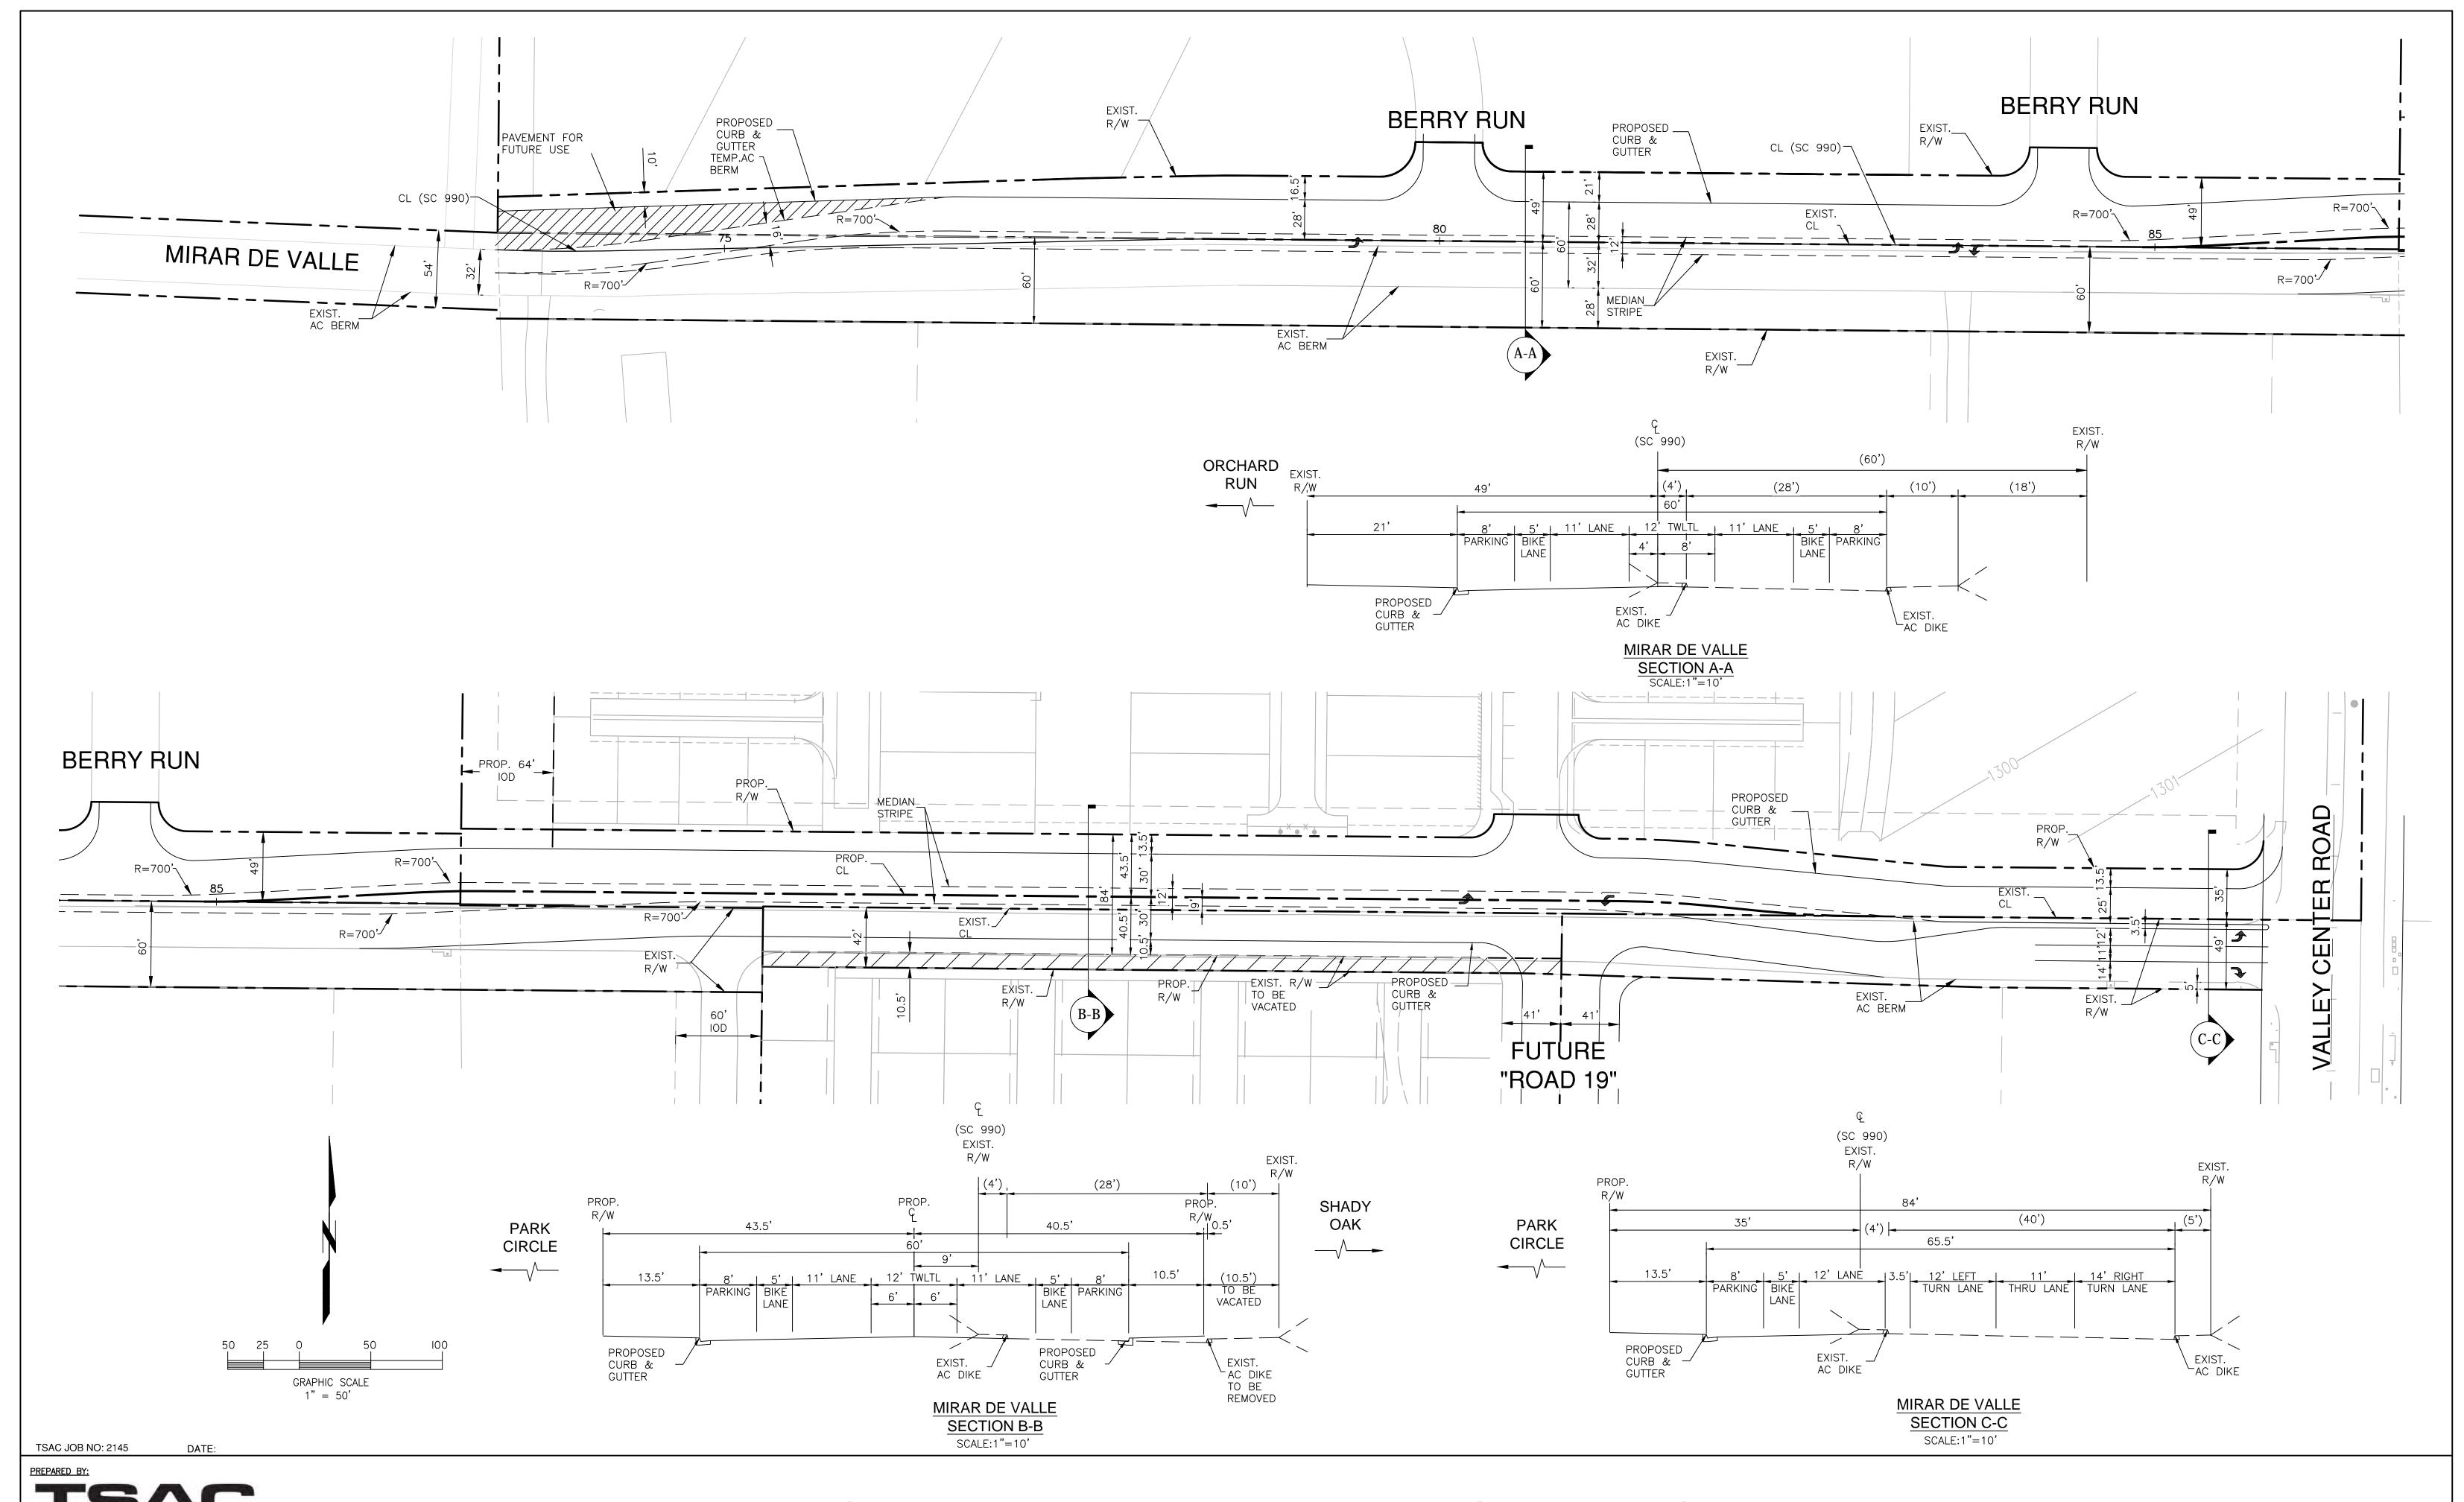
MIRAR DE VALLE STRIPING PLAN
